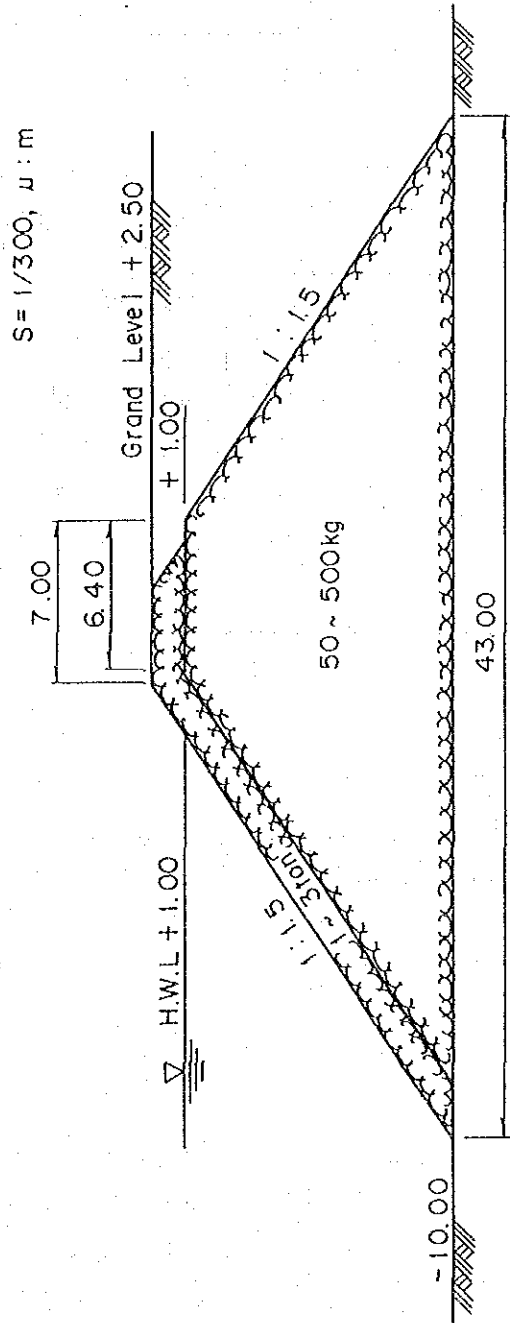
Typical Section of Protective Mound for Reclaimed Land
